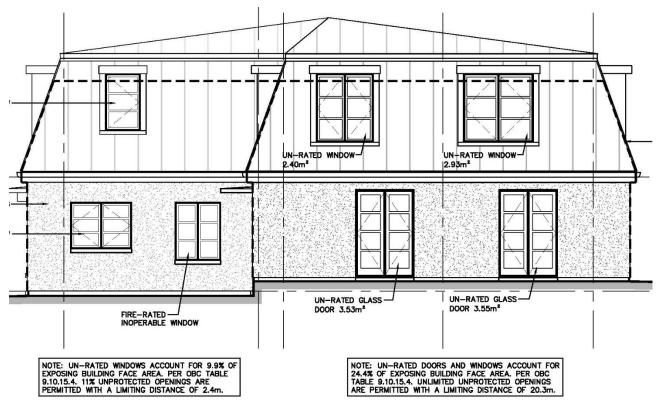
East Elevation (source: Shoalts and Zaback Architects Ltd.)
